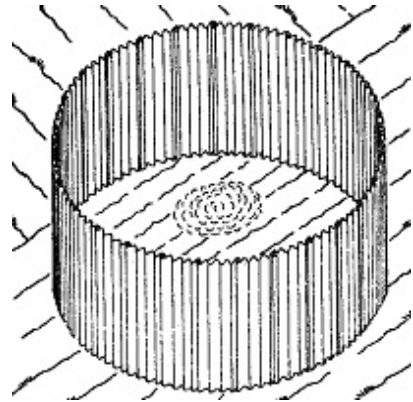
A ring of steel-sheet piling can alternately be used to ring the boil, if conditions permit.
